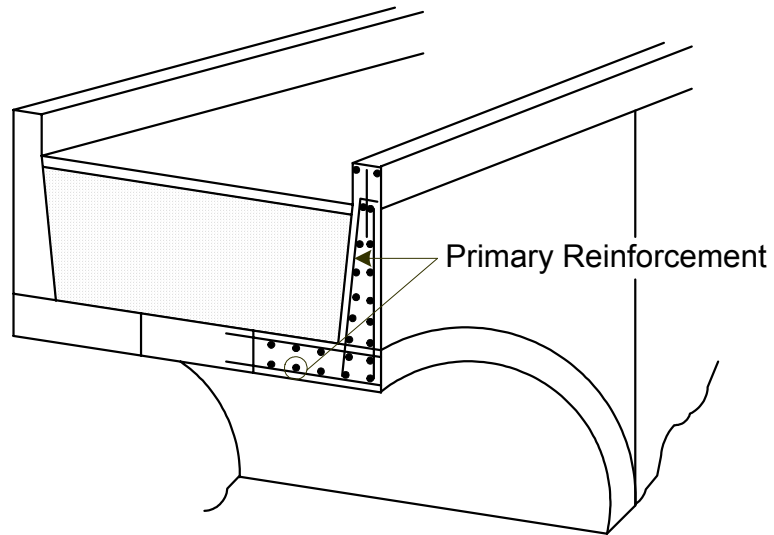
Reinforcement in a Closed Spandrel Arch
